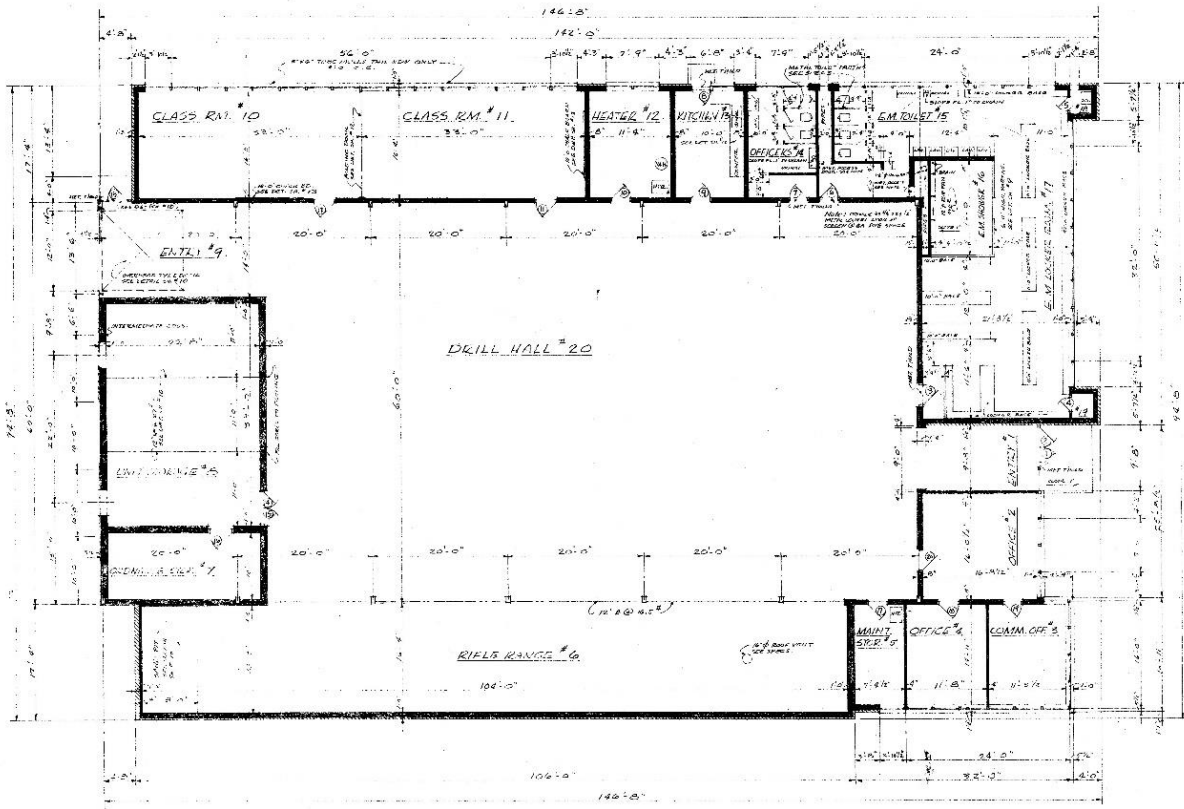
Floor Plan of B-Coffey & Olson Armory
